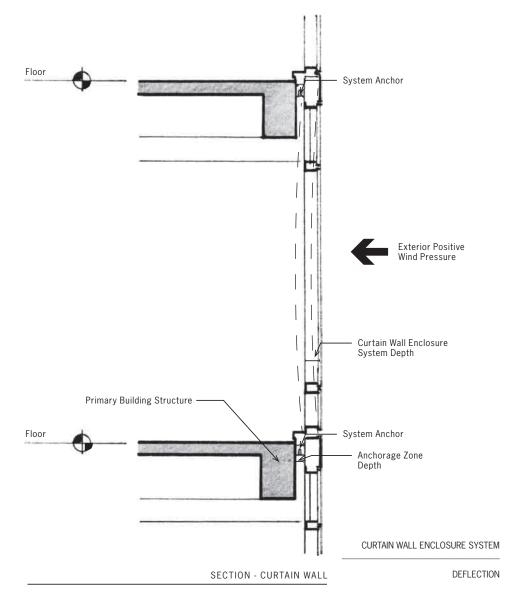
Curtain wall systems utilize the infill and/or cladding materials and the system framing material and depth to accommodate and transfer wind loads to the system anchor. The system anchor transfers loads to the primary building structure. Negative wind pressure creates deflection in the opposite direction. Note infill materials also deflect when subjected to lateral loads.
